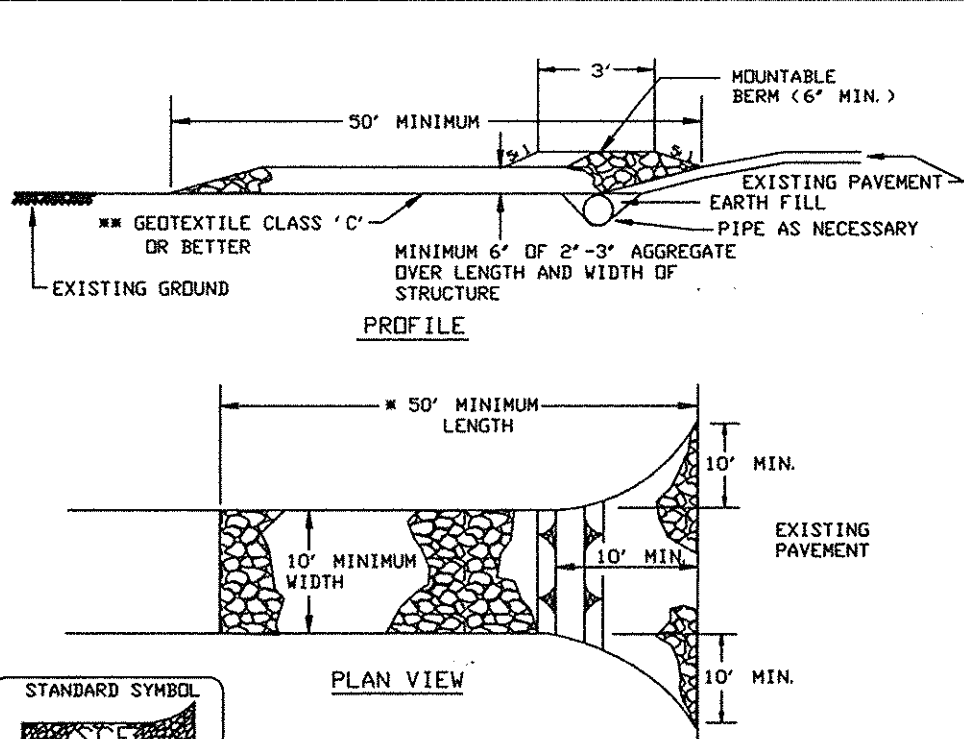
DETAIL SHEET CHERRY CREEK OVERLOOK
